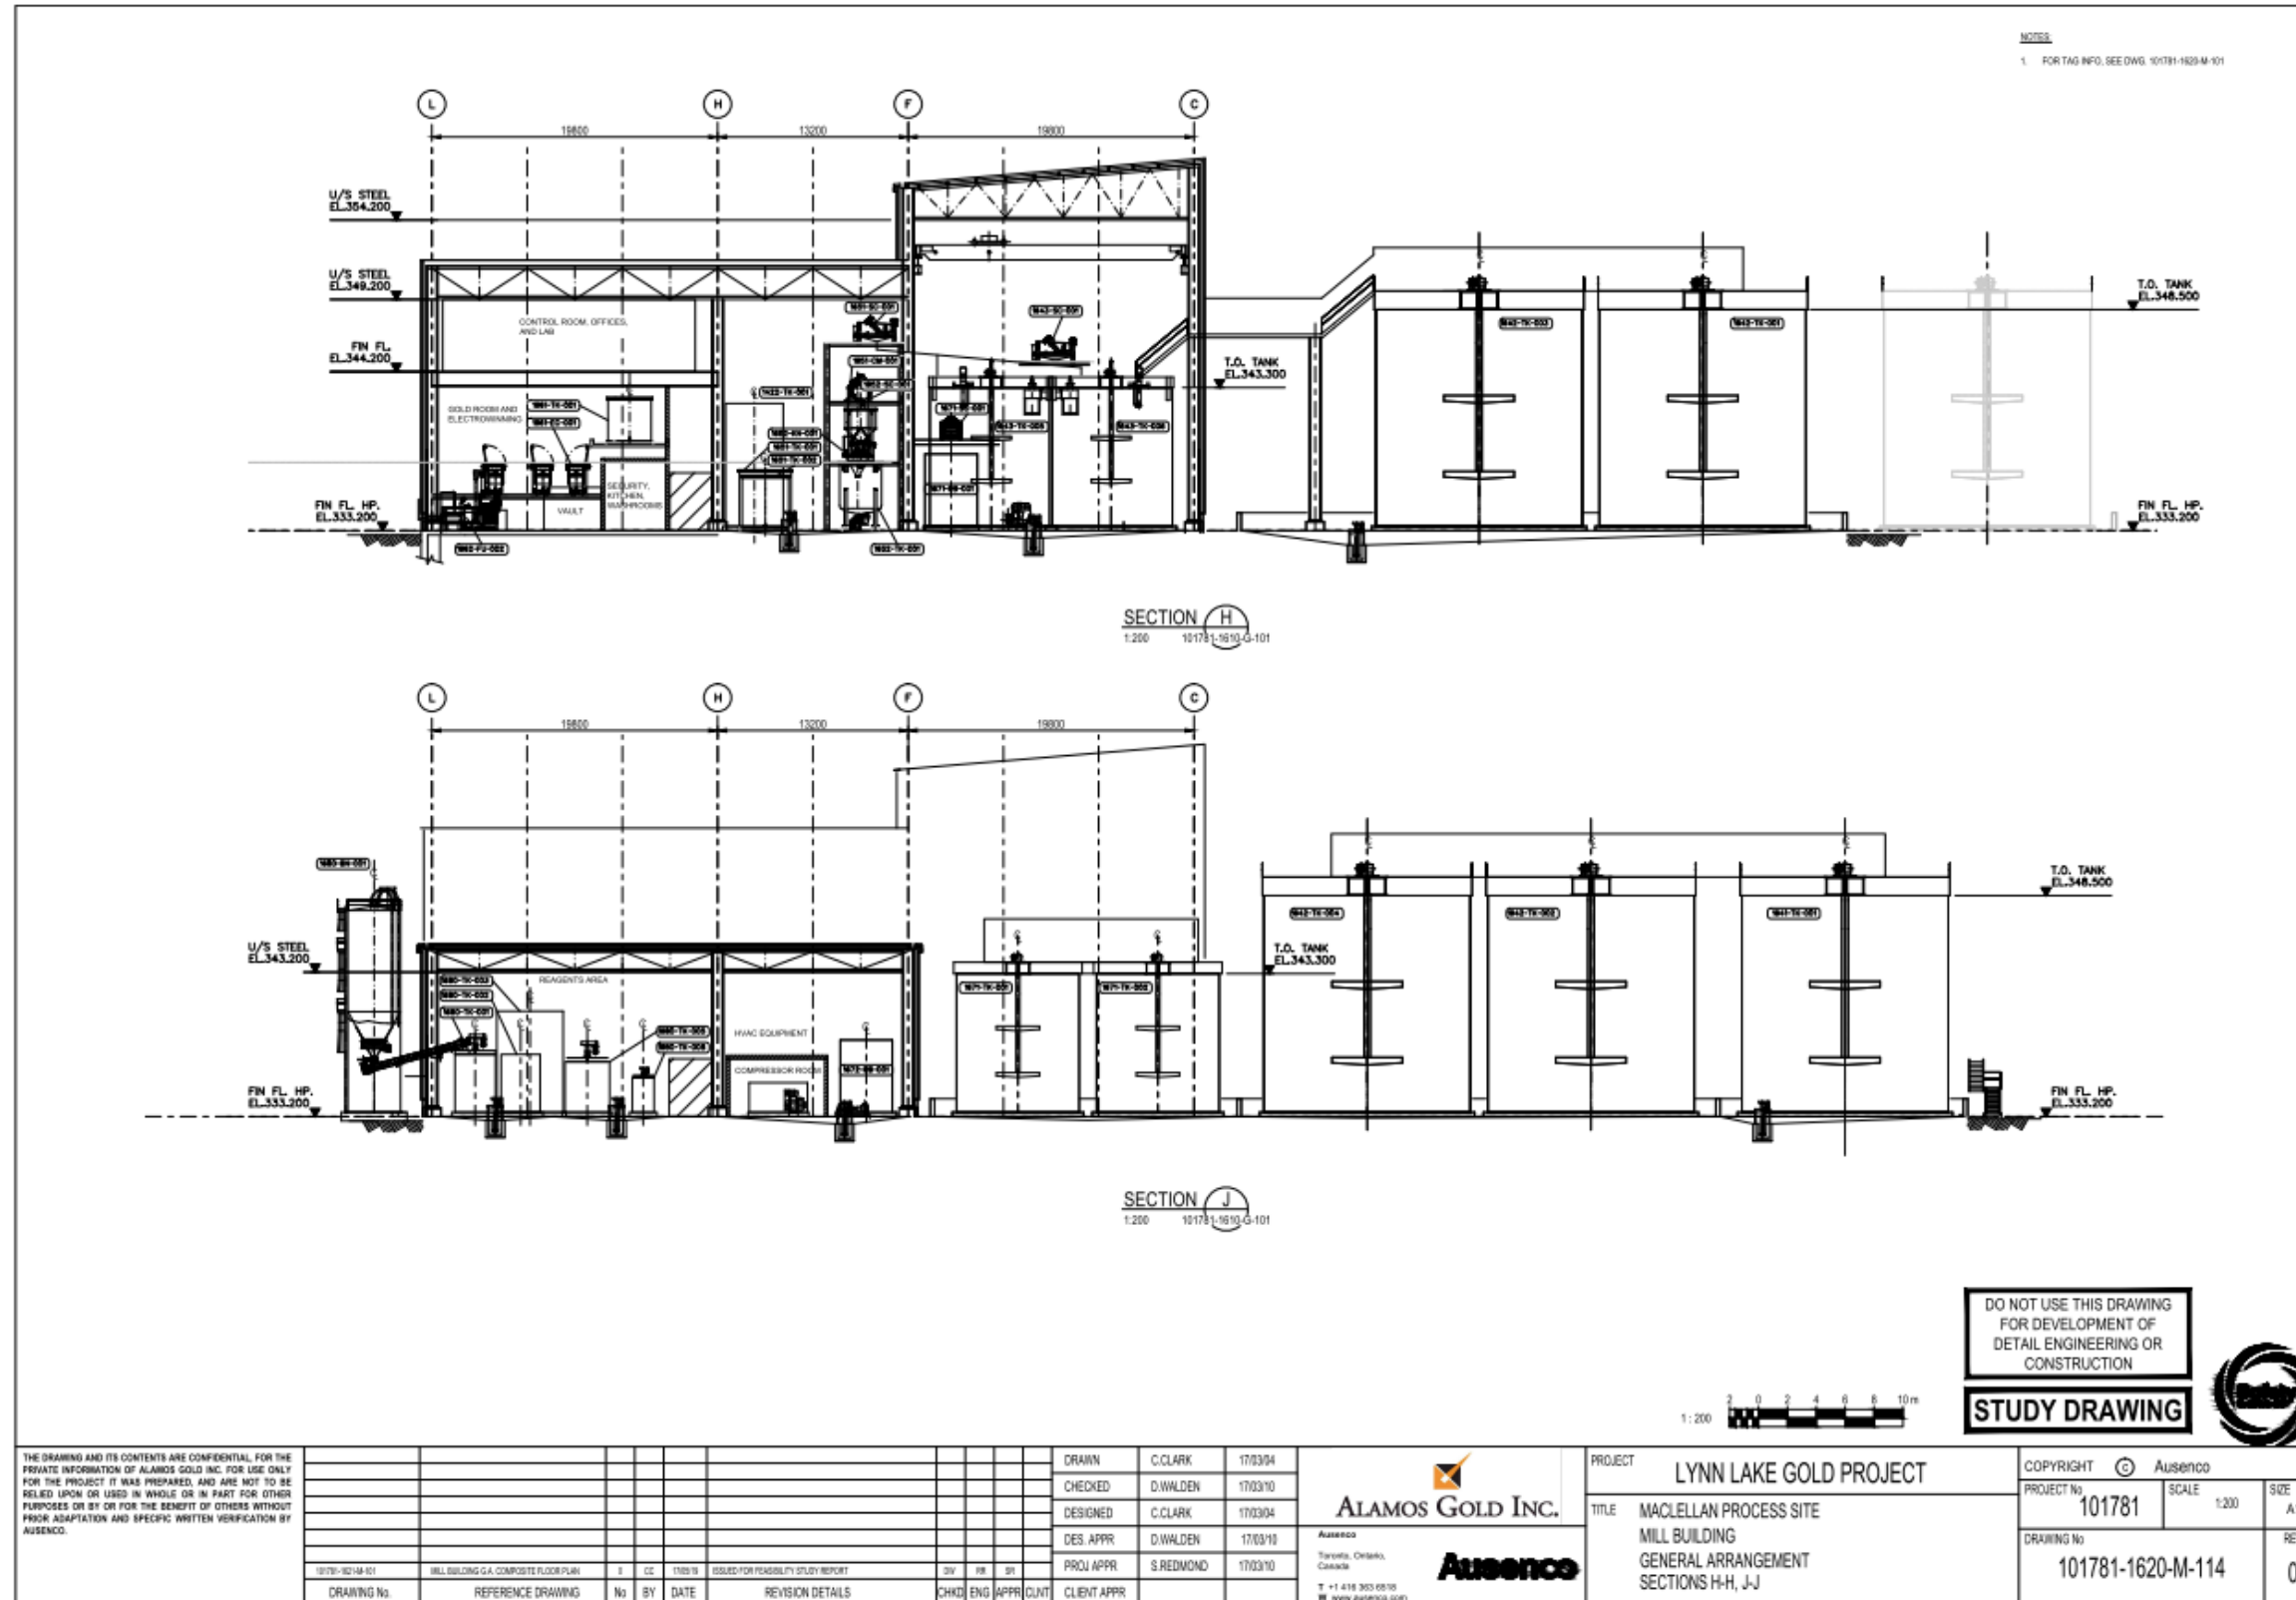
MacLellan Mill Building General Arrangement, H-H and J-J
